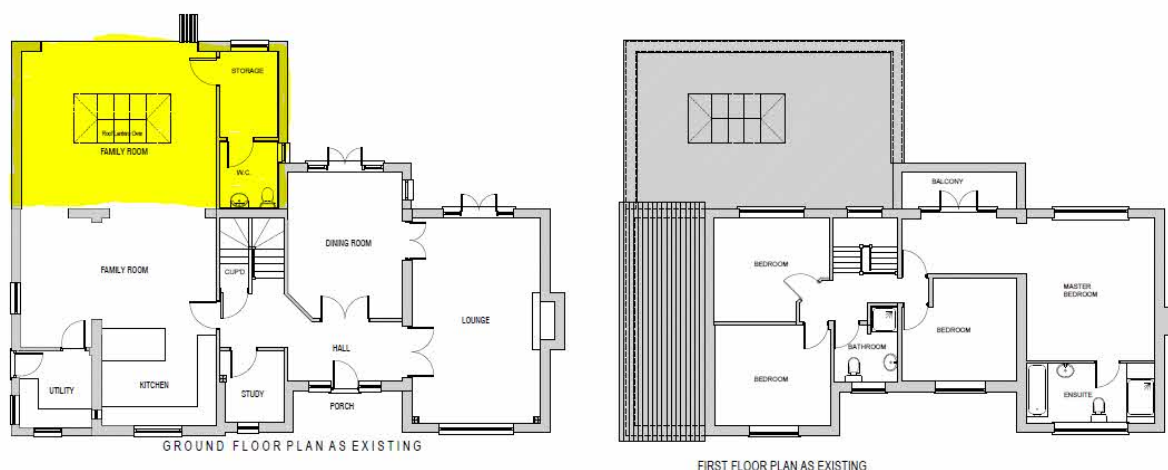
Permitted Development extension to the dwelling (2014/2015 Certificate applications)
